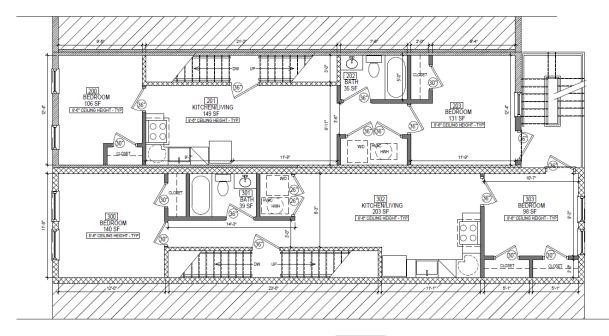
46-48 S. Carrollton Avenue – Proposed second floor plan
